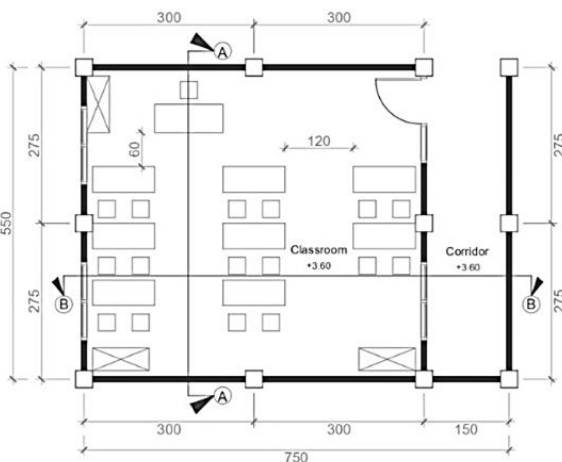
5th-grade classroom window on the second floor (source: author's analysis)
